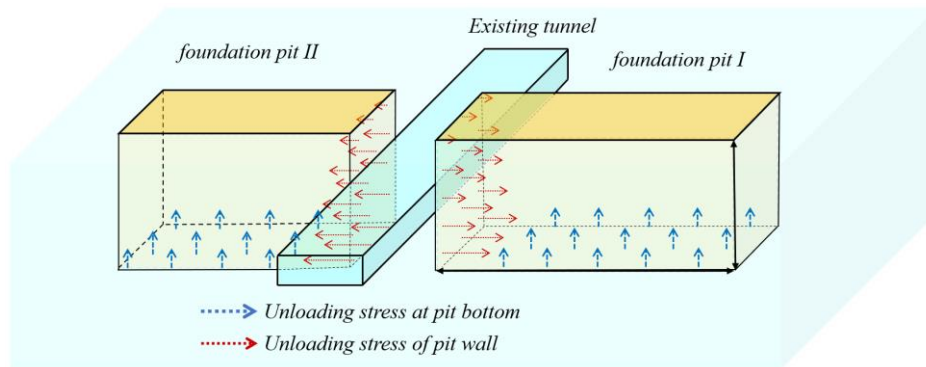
Schematic diagram of the unloading effect of foundation pit excavation
